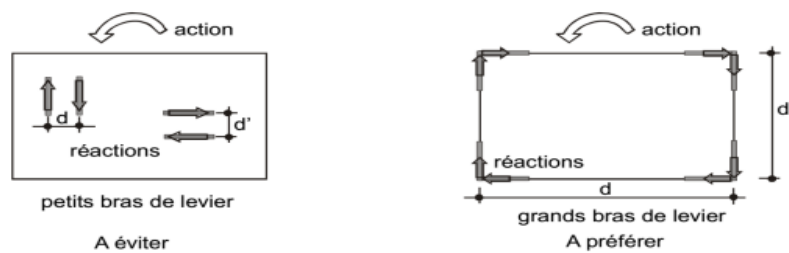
Spacing between bracing elements. (AFPS, 0220)
